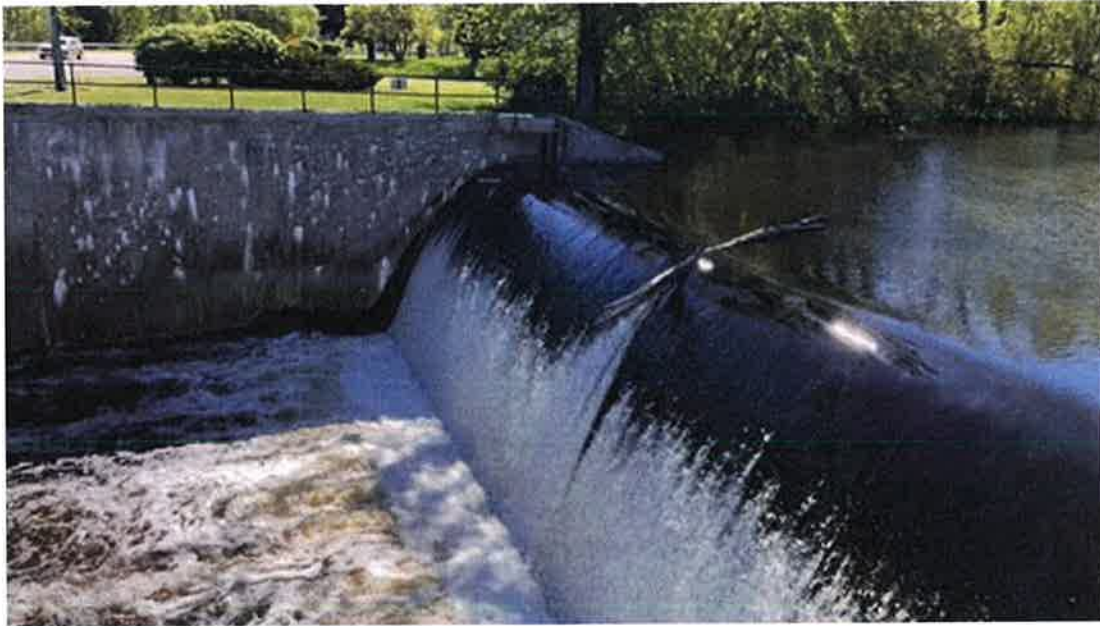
Spillway crest. Note branch stuck on crest that should be removed
